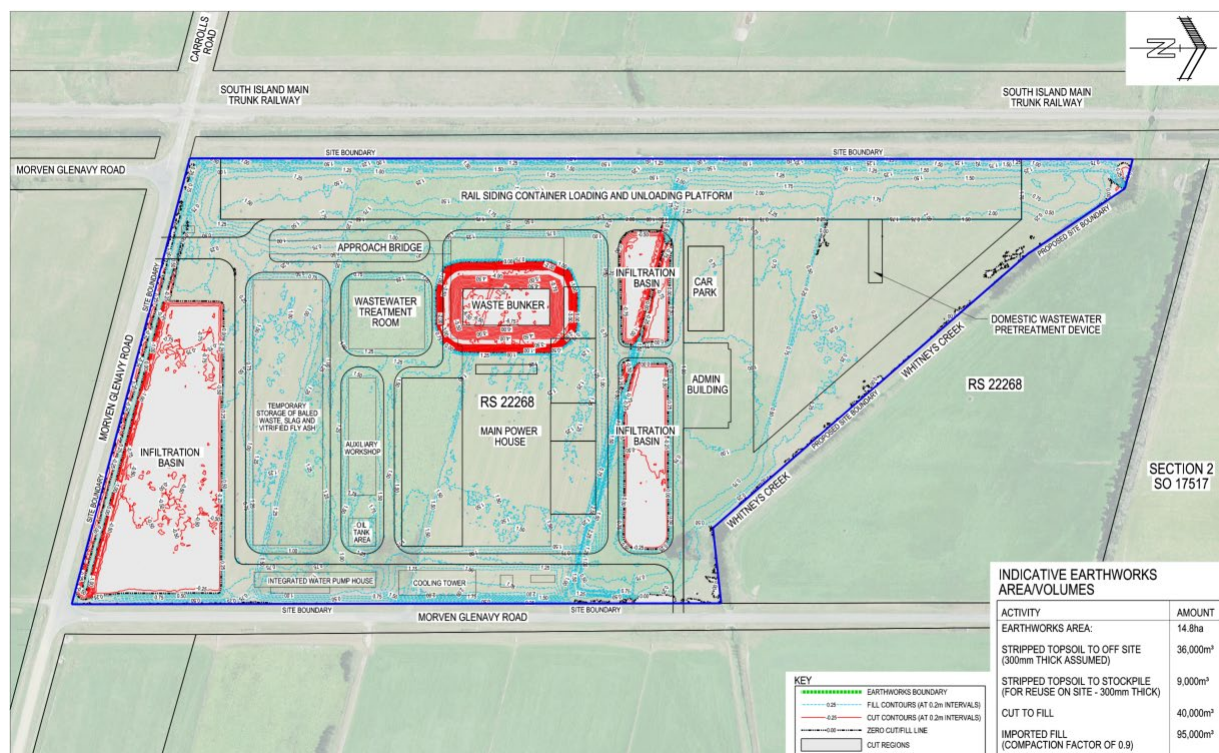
Proposed earthworks cut and fill plan (extract from Earthworks Report⁶ drawing C02)
